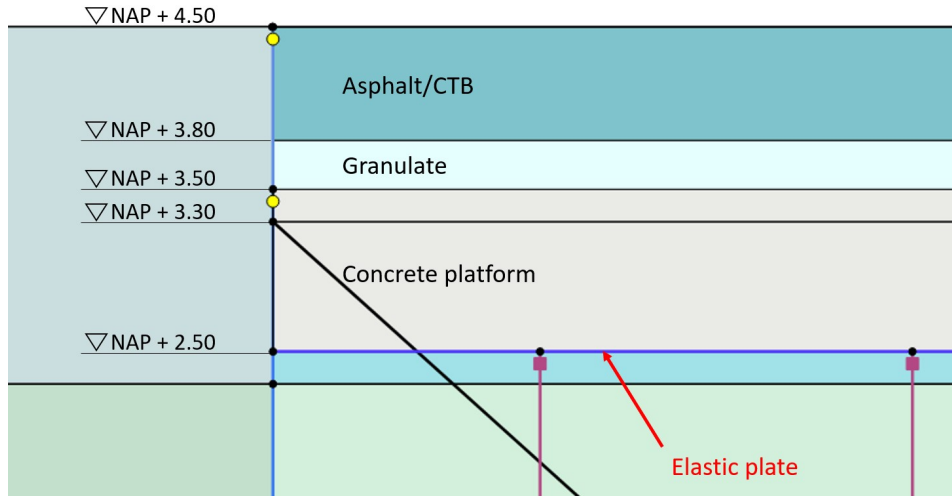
Detail of connection piles-platform and connection wall-platform
